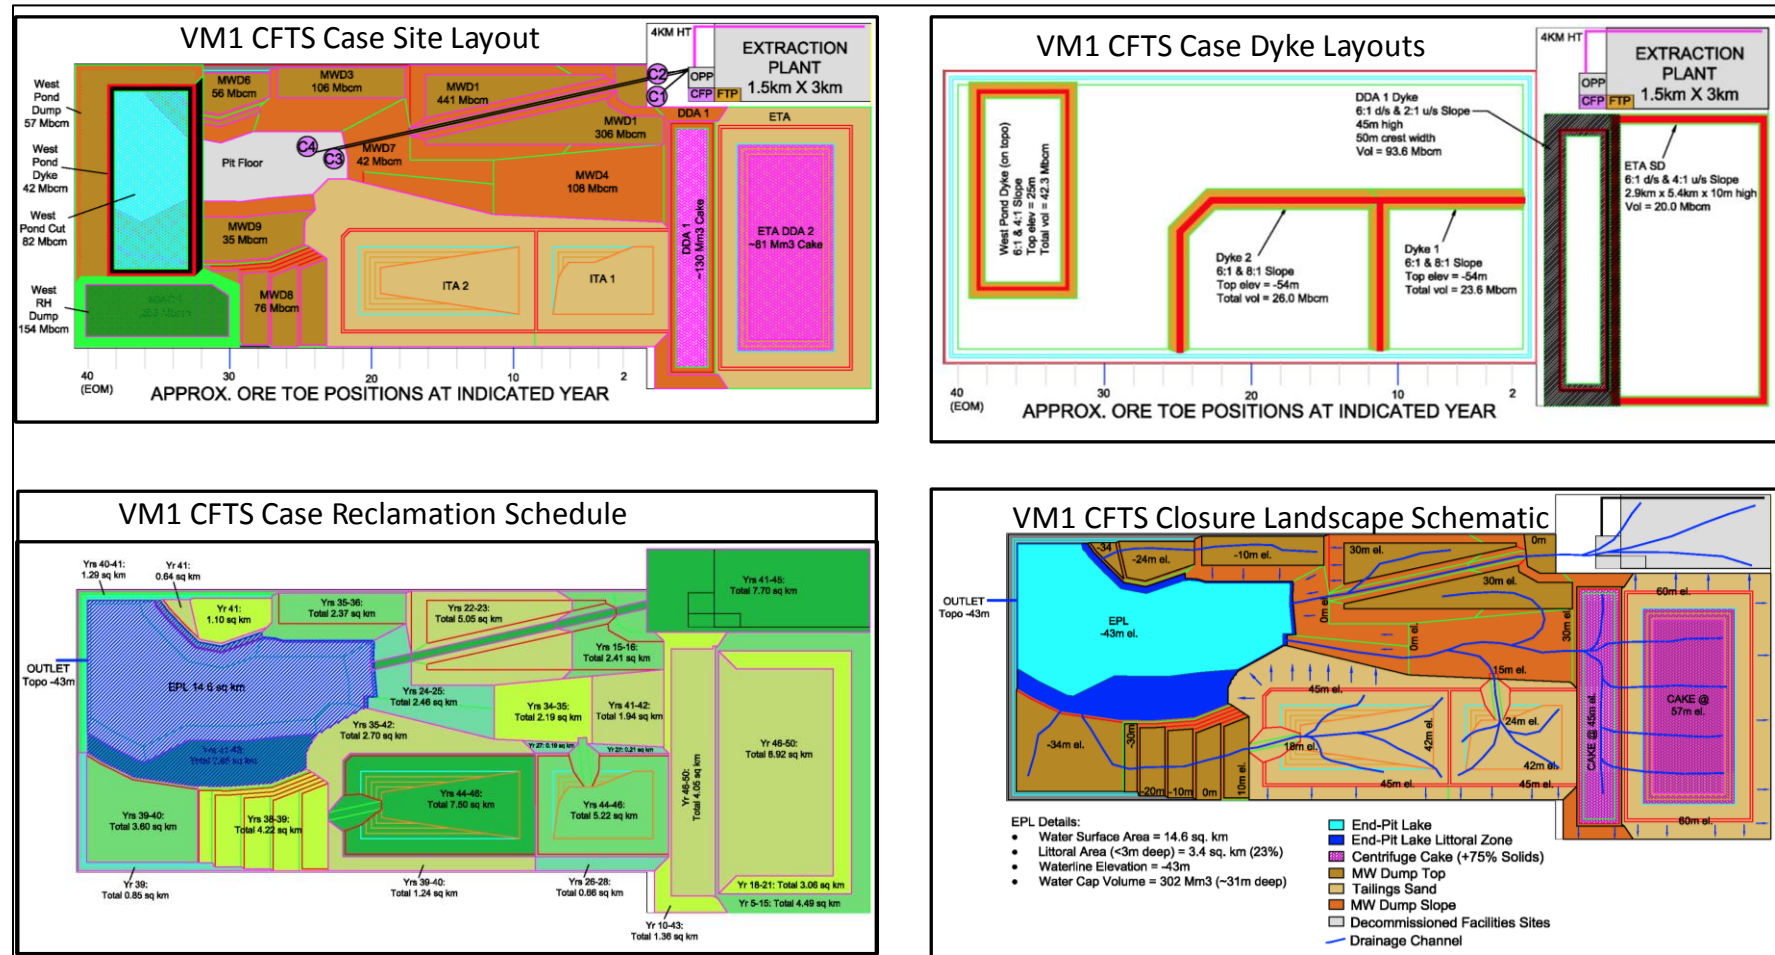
Site Layout and Progression to Closure for VM1 CFTS Case
